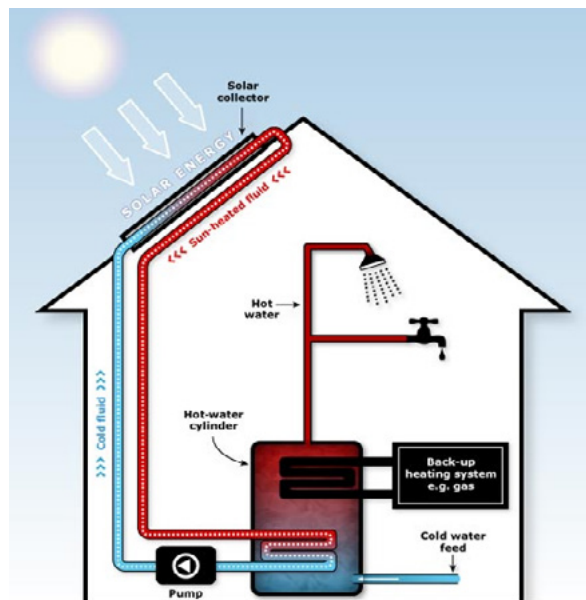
A picture of a storage tank connected to solar collectors in a building
